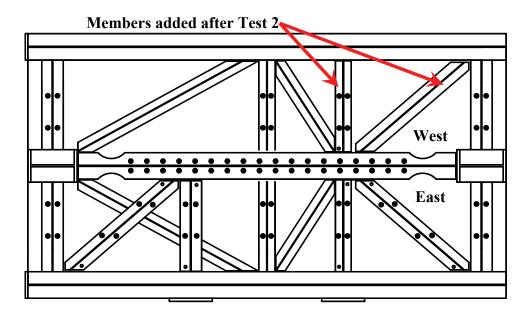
Layout of the Intermediate Floor Truss Strengthened after Test 1
